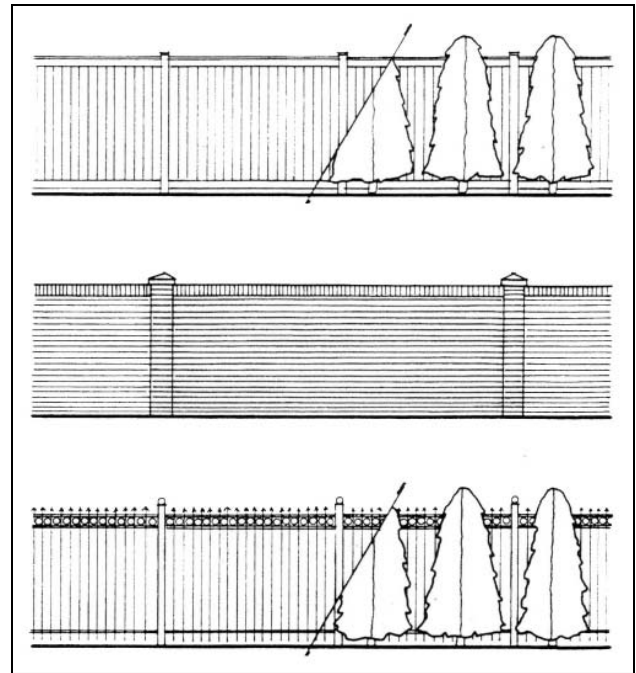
Examples of preferred screening walls and fences for loading docks, storage yards, trash enclosures and mechanical equipment include solid board fence, brick wall and steel picket fence.
